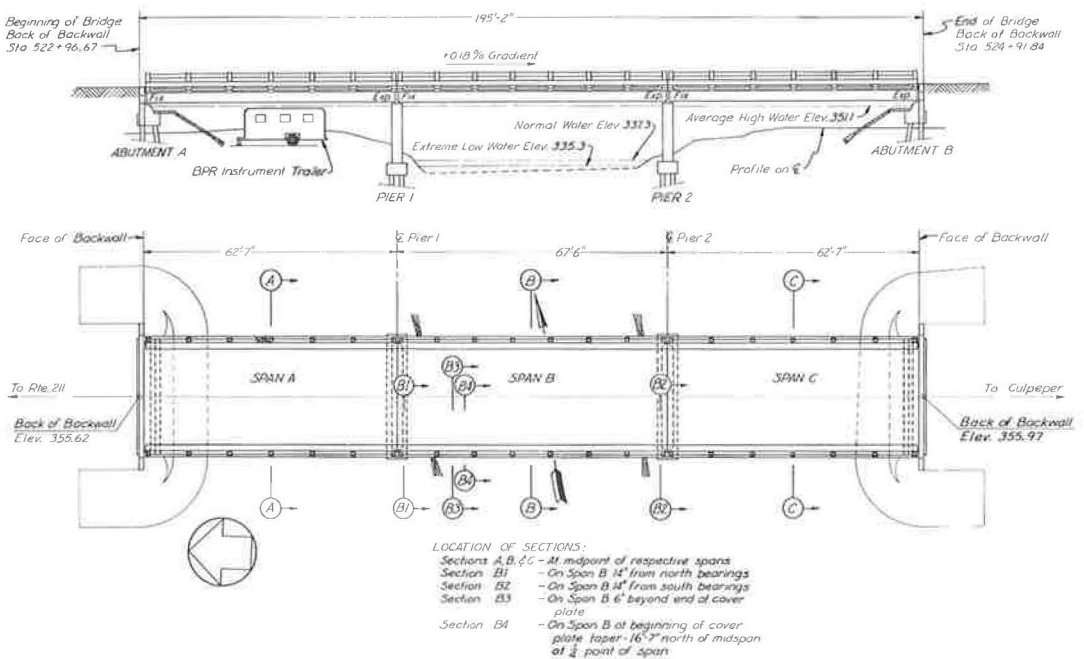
Profile and plan of Hazel River Bridge, indicating test sections.
